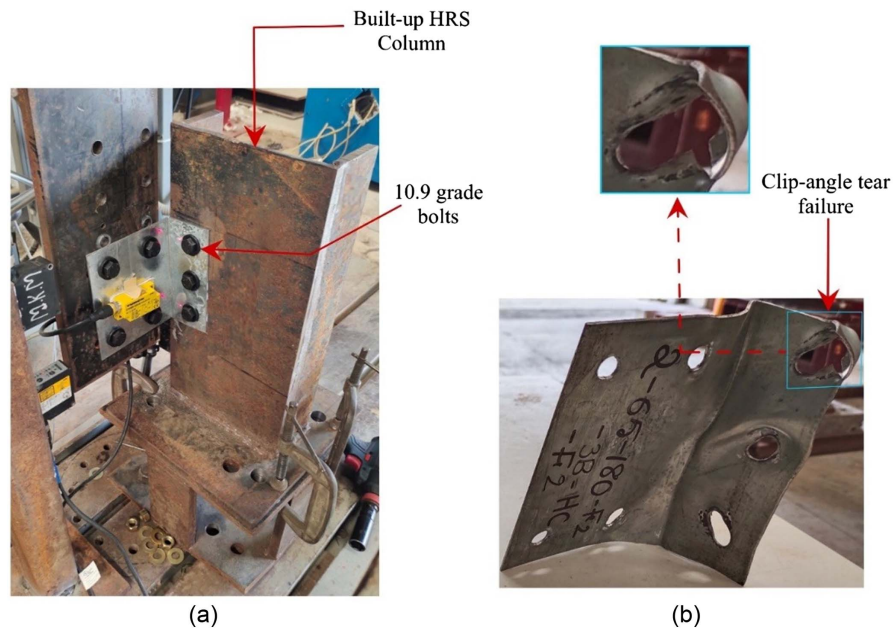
Phase-III work: (a) HRS column and 10.9-grade bolts test setup; and (b) clip-angle tear failure with no bolt failure.
